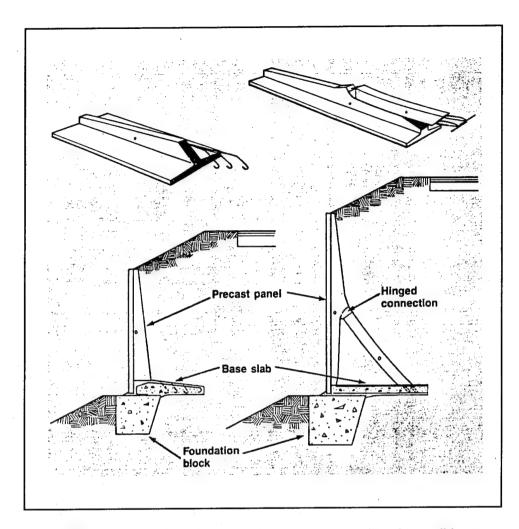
Design for retaining-wall system used for shopping mall in Massachusetts; this wall supports panels to 16 ft high (from Randall 1989)
